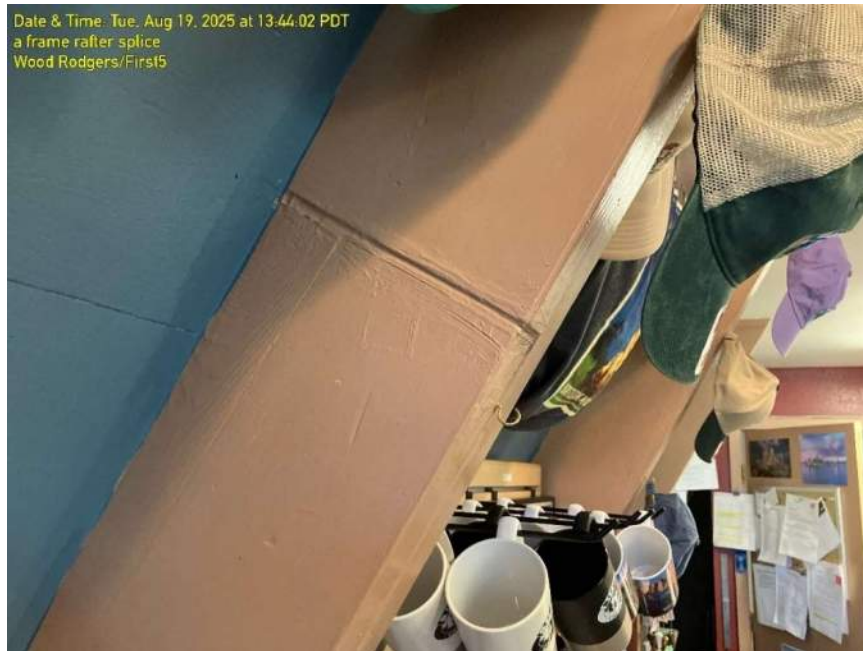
North side roof at interior rafter splice below collar tie connection.
